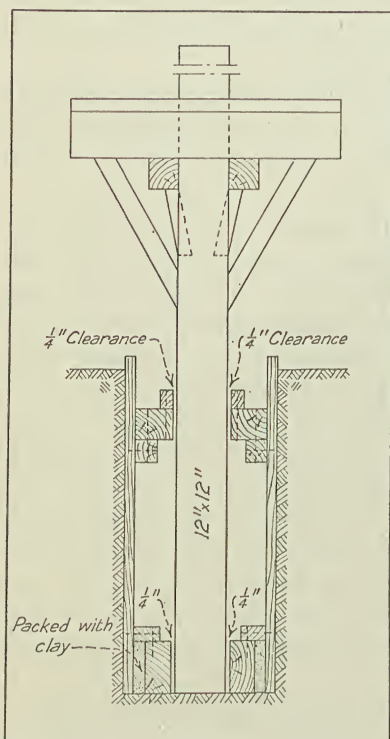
Apparatus for Tests on Bearing Power of Soils
